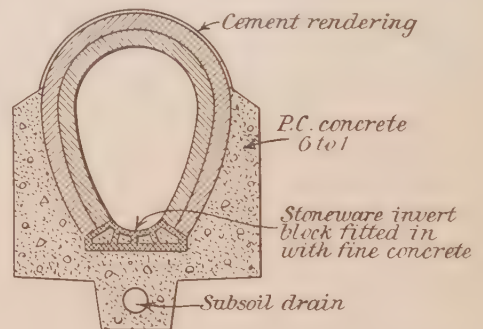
Section of Egg-shaped Sewer, showing use of Invert Block and Subsoil Drain.
